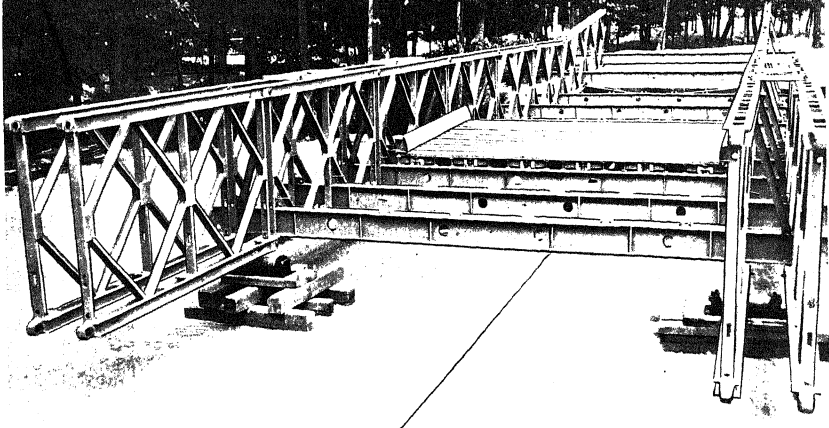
First bay, DS, assembly—first bay braces tightened and bay decked.
